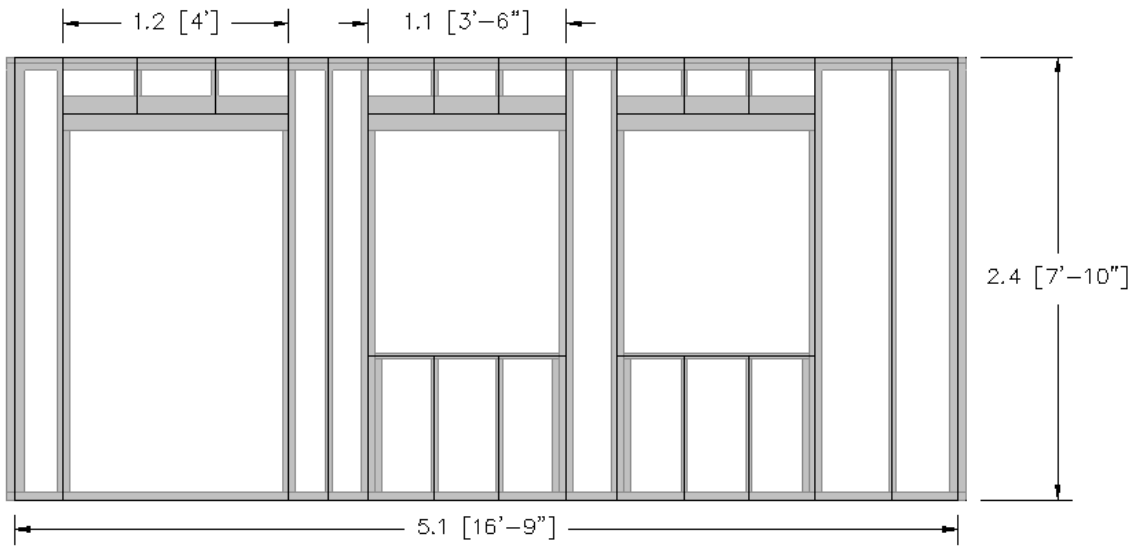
Example of Assumed Framing with SAP2000 Wire Frame Overlay for Wall 2 – m (ft-in)
